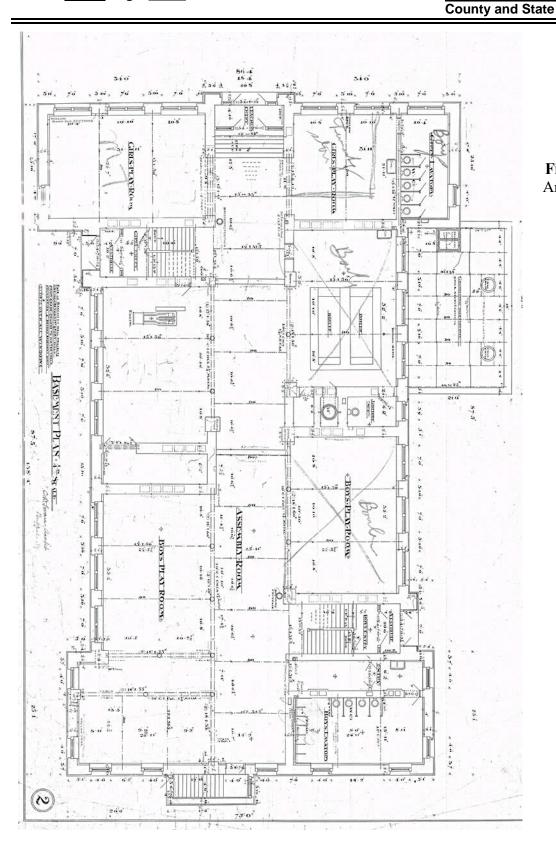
Basement Plan Architectural Drawings for Public School 24 C.D. Swan 1901
